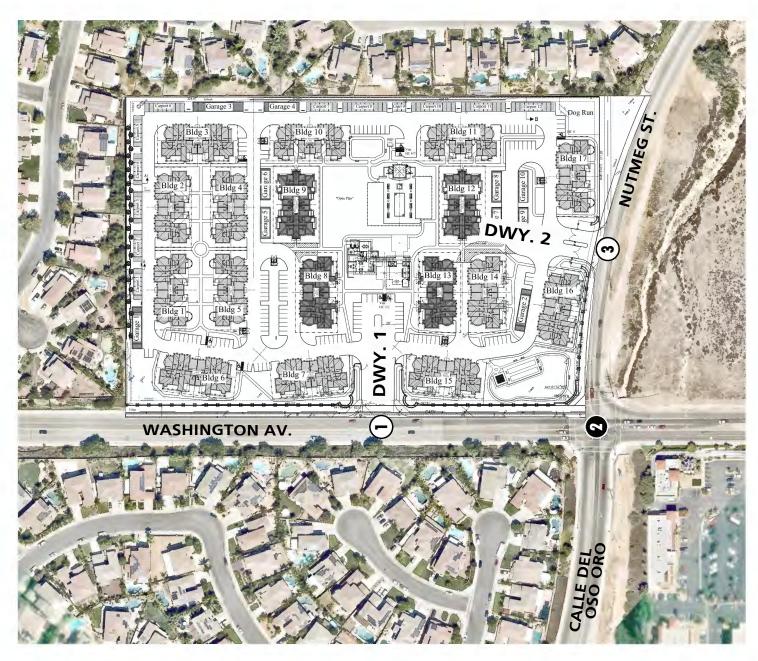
PRELIMINARY SITE PLAN
